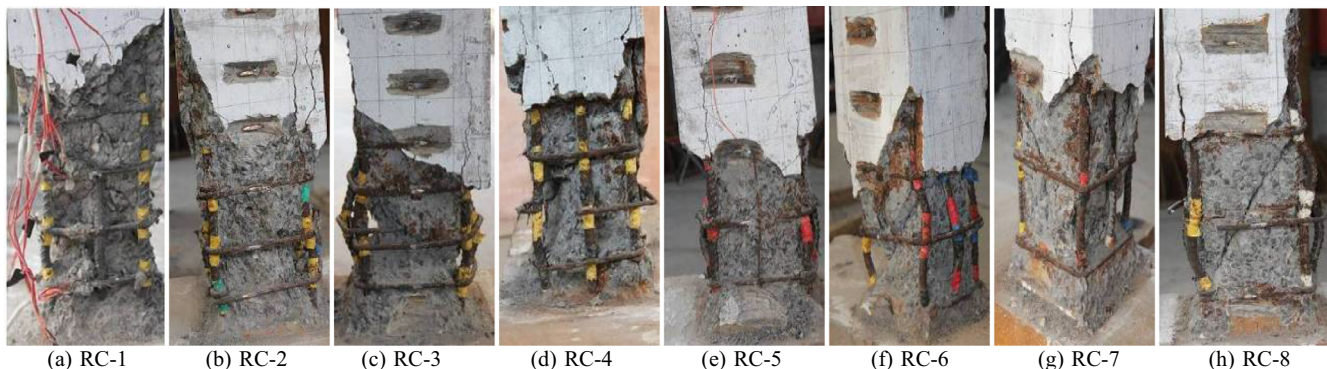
Failure pattern of concrete column confined by the corroded stirrups.
